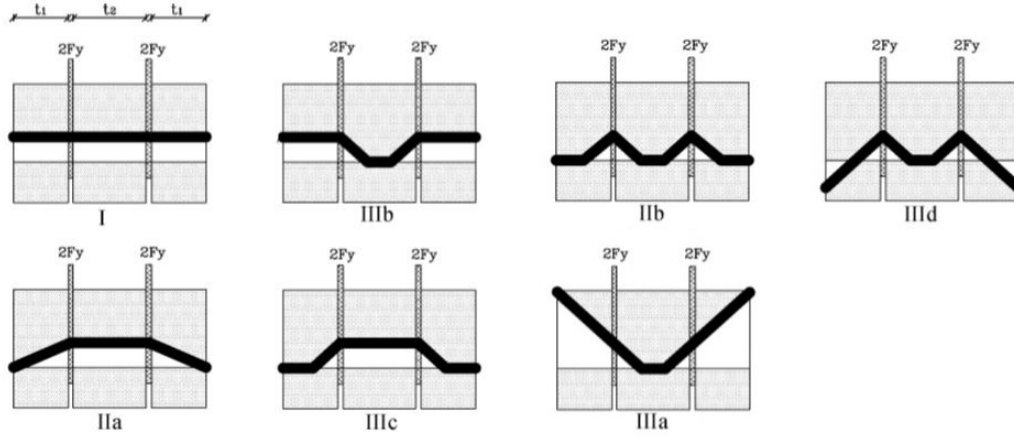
Failure modes for dowel connections with 2 steel plates [47]
